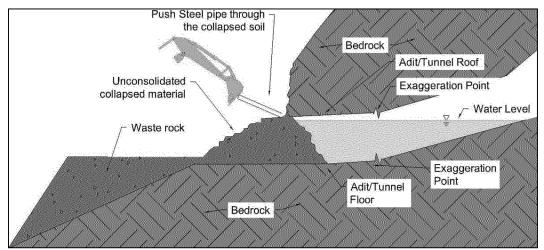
Cross-section illustration showing step 2 of the plan (not to scale). With the bedrock above the crown of the adit exposed as a guide, a steel pipe called a "stinger" is positioned and pushed into the fill using the bucket of the hydraulic excavator.
